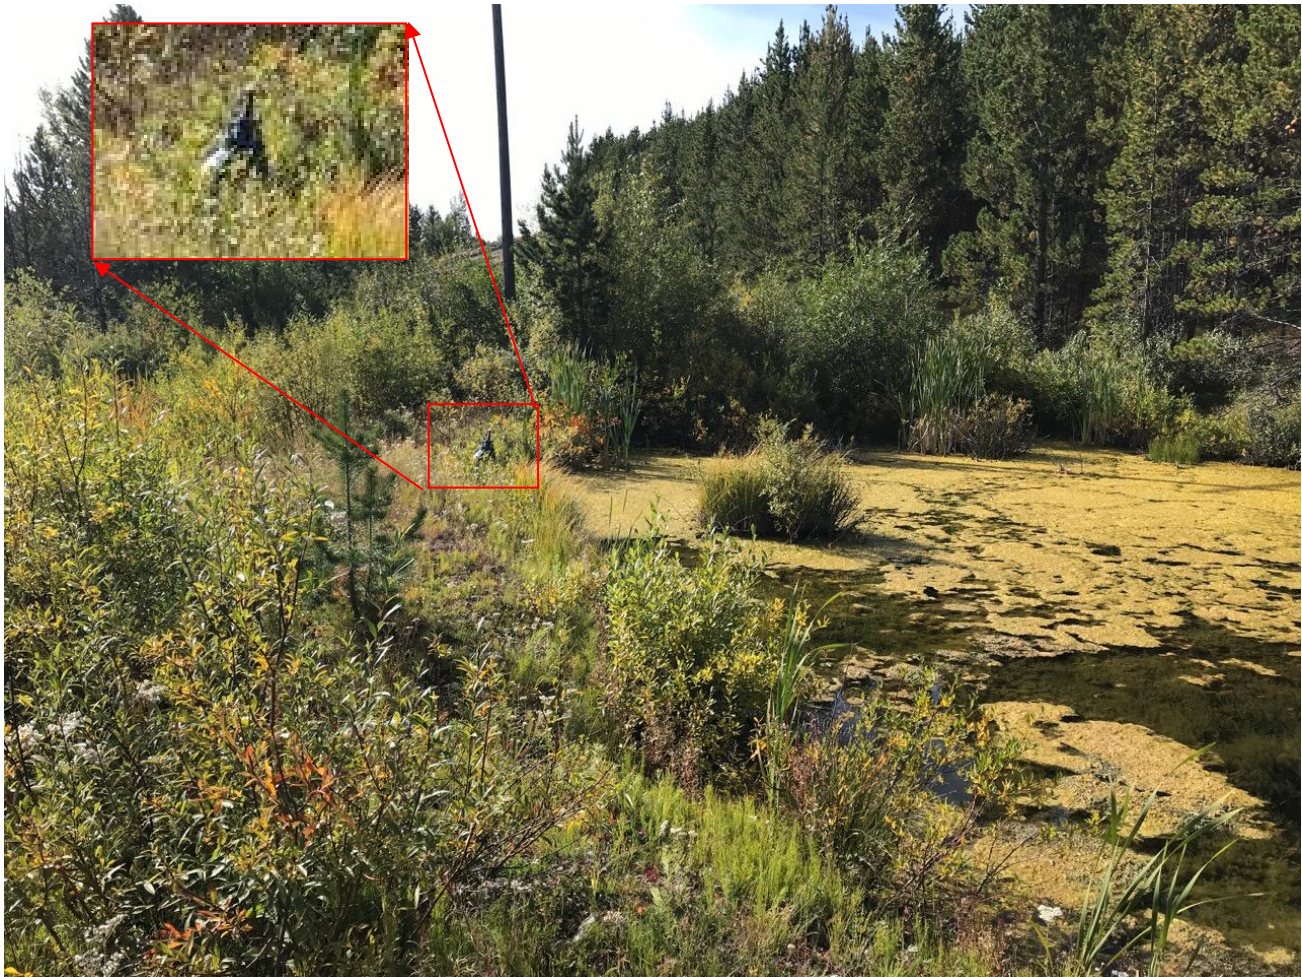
S5: Upstream slope of central pond looking south towards right abutment. Slope is in good condition (HGH-2018-22)
